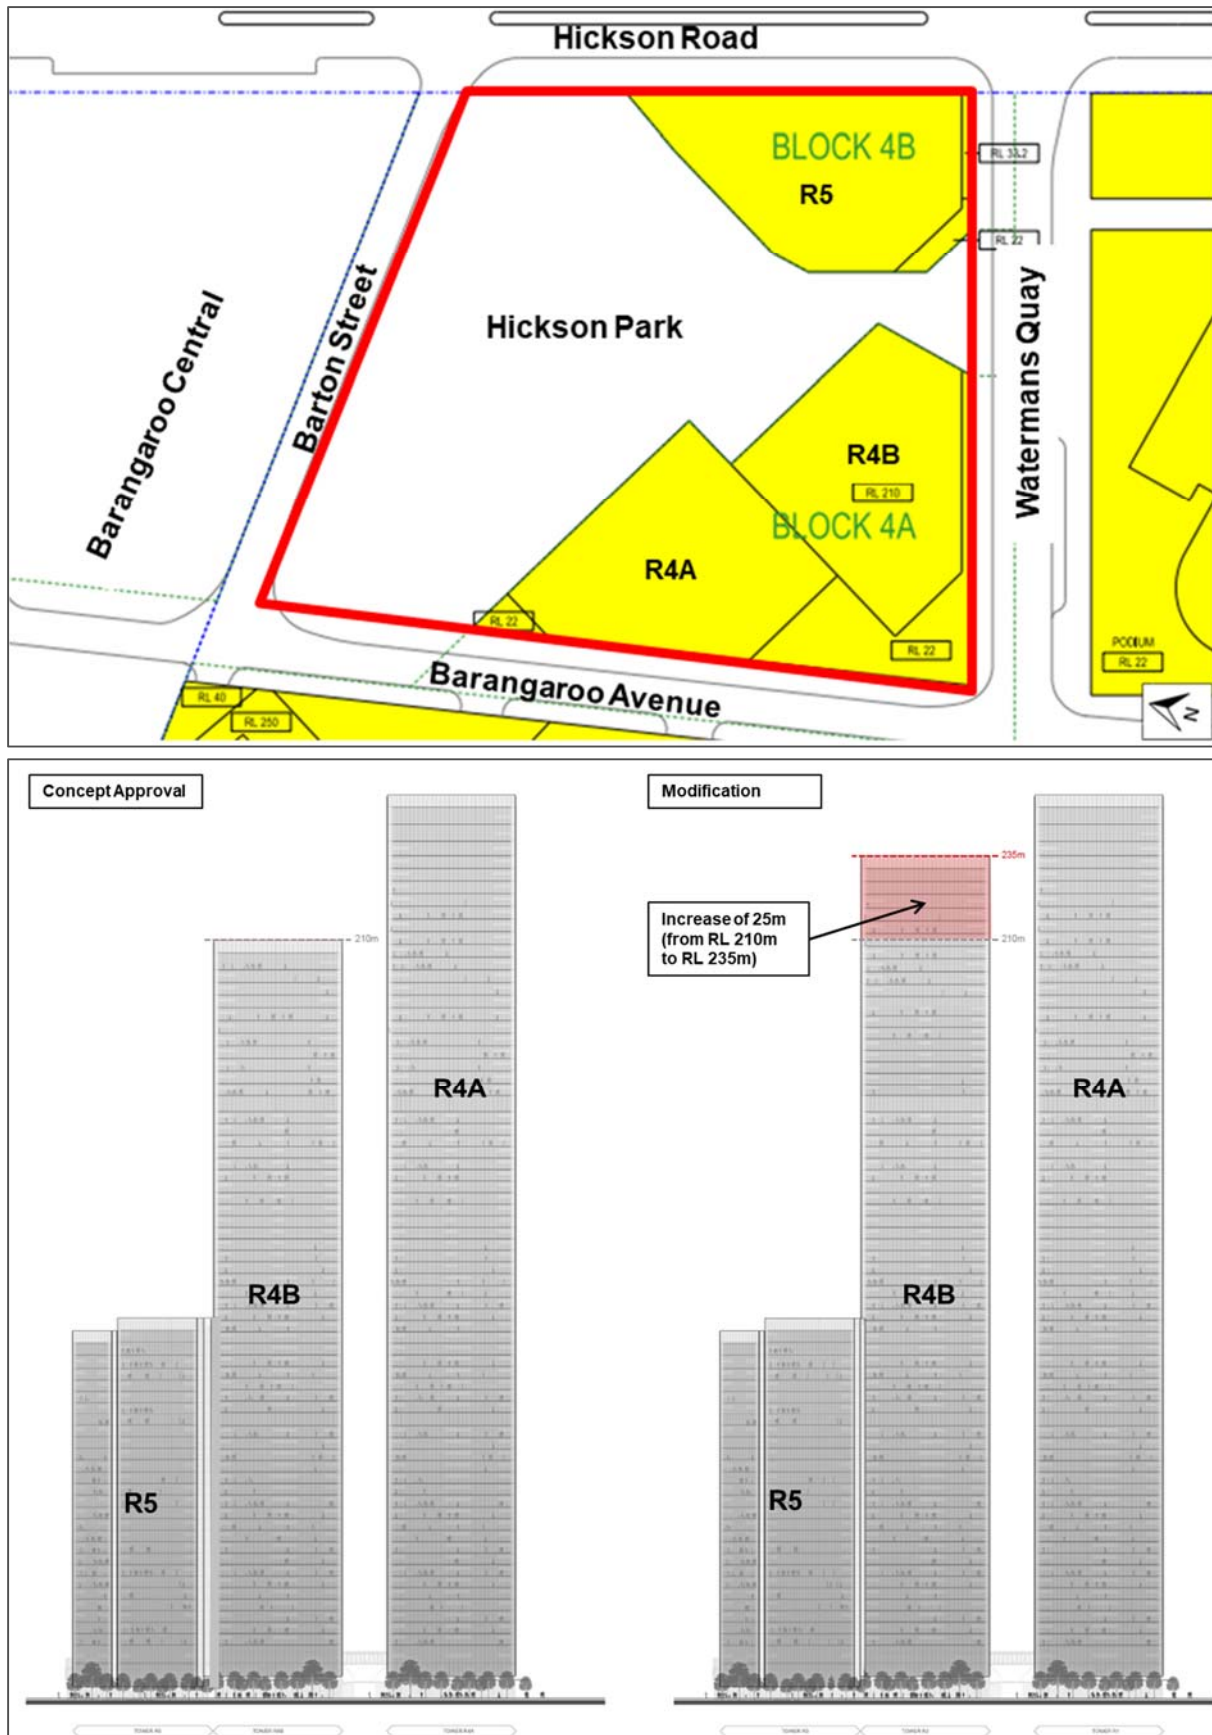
| Location of building envelopes (top) and approved (bottom left) and proposed (bottom right) R4A, R4B and R5 building envelopes (Base source: Proponent's EA)
